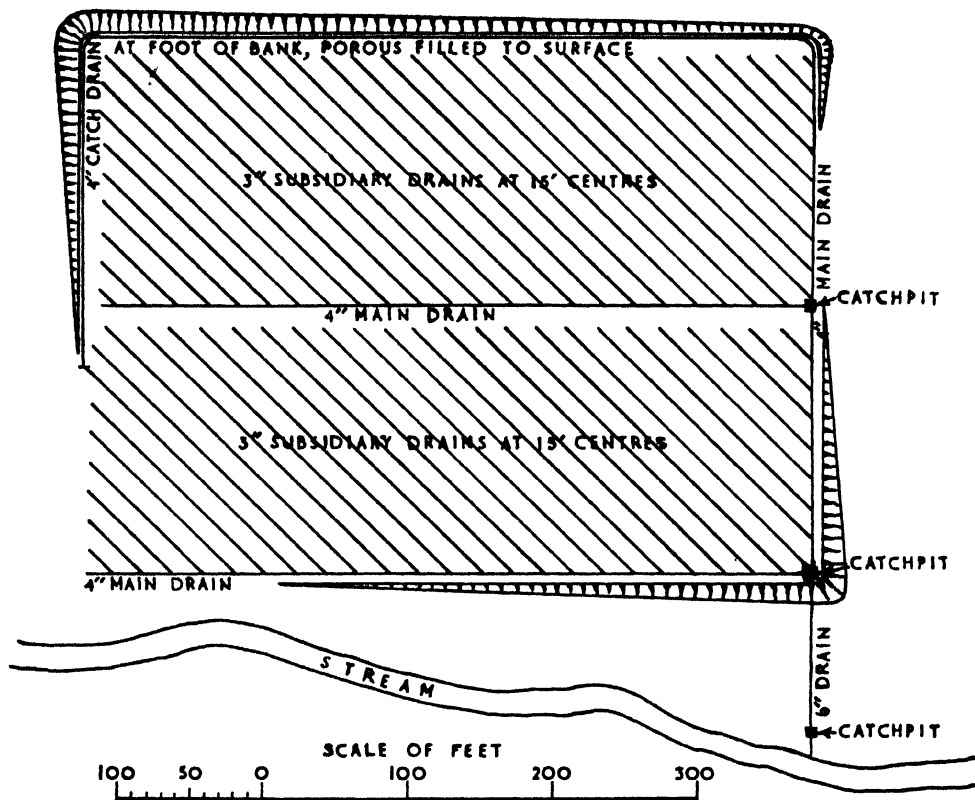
TYPICAL EXAMPLE OF SPORTS FIELD DRAINAGE
